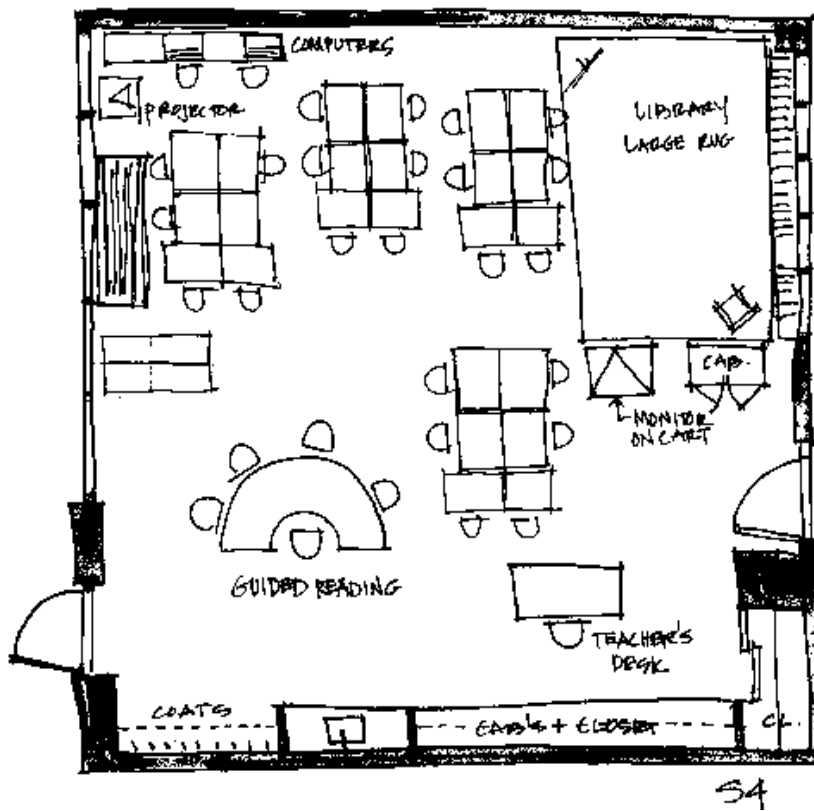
A typical fourth-grade classroom floor plan with furniture layout.
